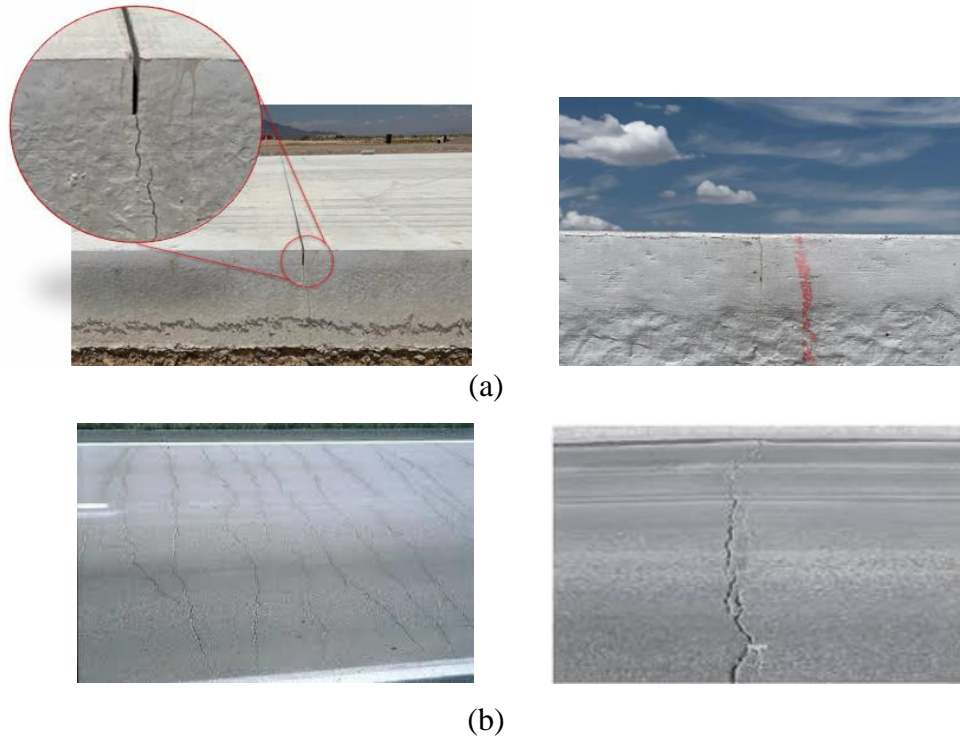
Example of cracks propagation over the rigid concrete slab's thickness due to a) curling and b) expansion
